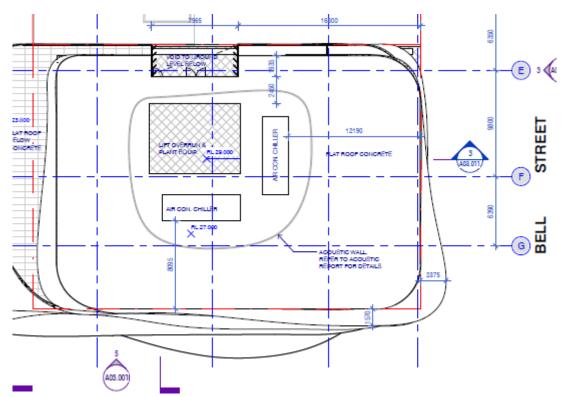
Roof plan showing projections into road reserve. Red line is title boundary. Source: Application documents
